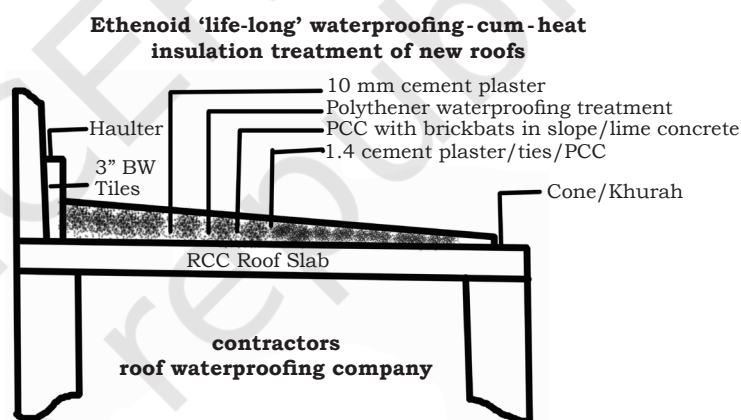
Waterproofing of R.C.C. Roof Slab
